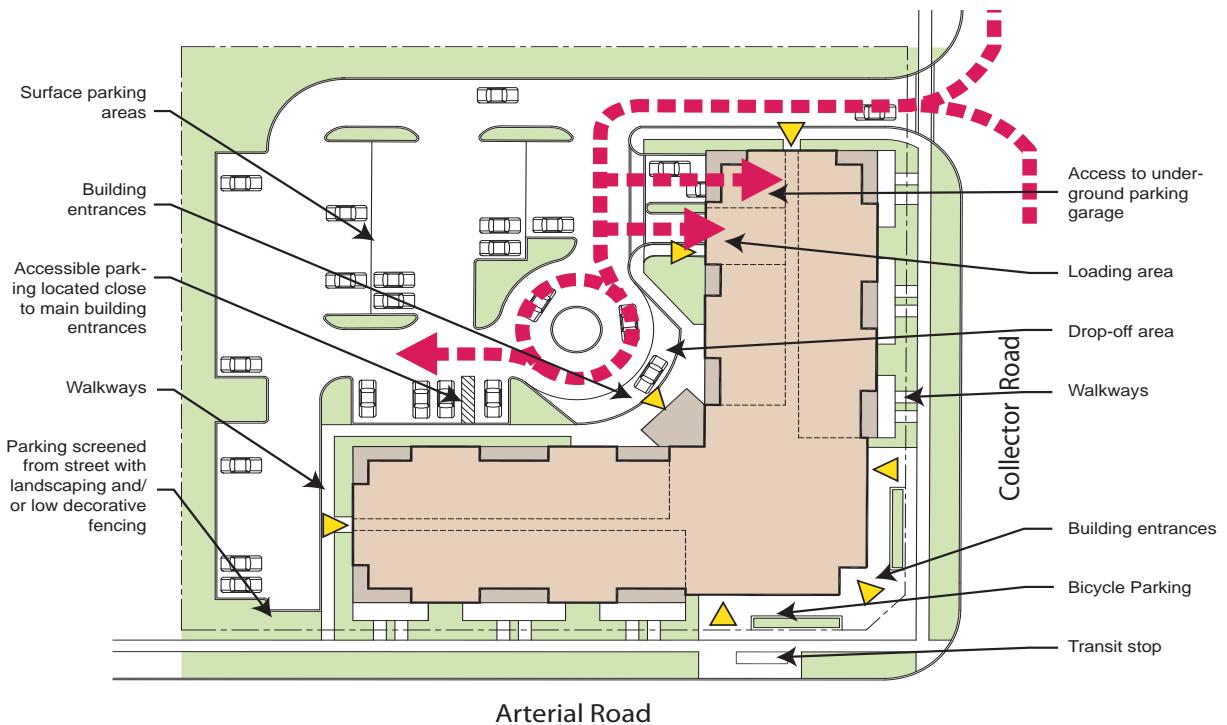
Conceptual site access and circulation demonstration plan
